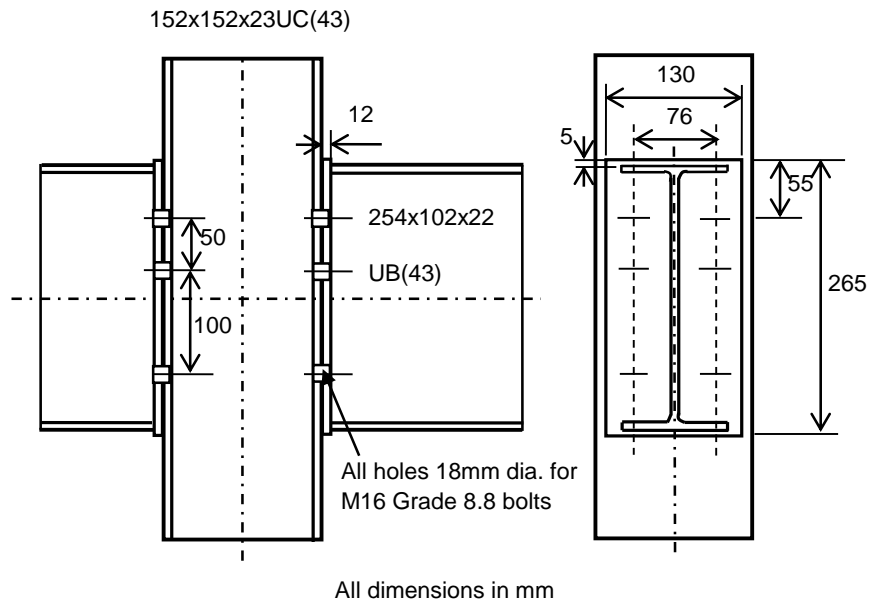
Details of test specimens used by Leston-Jones (1997a)
